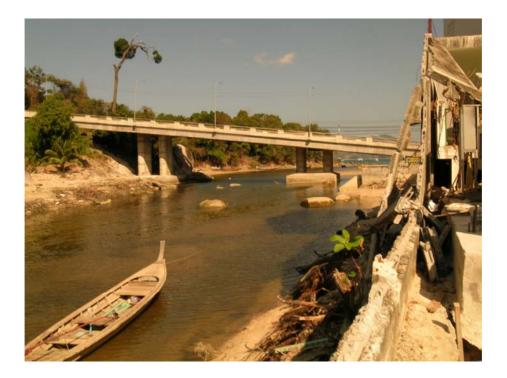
43: No damage was observed on the cross-river bridge at the south of Patong Beach, however the pile caps under the piers have been partially exposed by erosion.
